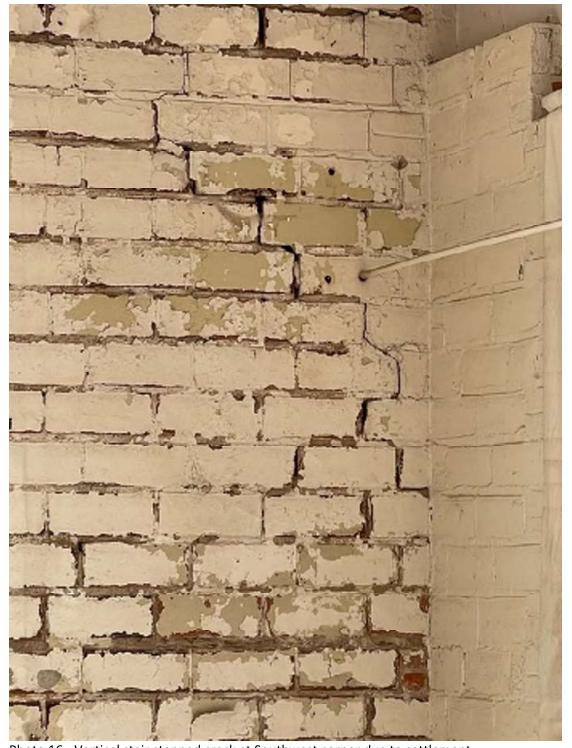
Vertical stair stepped crack at Southwest corner due to settlement
